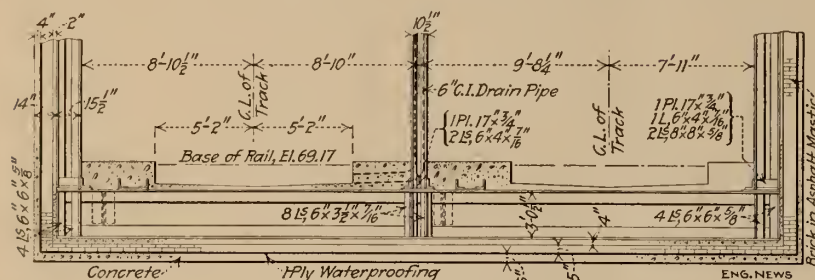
B. R. T. SUBWAY ON BROADWAY AT CANAL ST., SHOWING VERY HEAVY FLOOR TO RESIST UPWARD PRESSURE OF WATER
